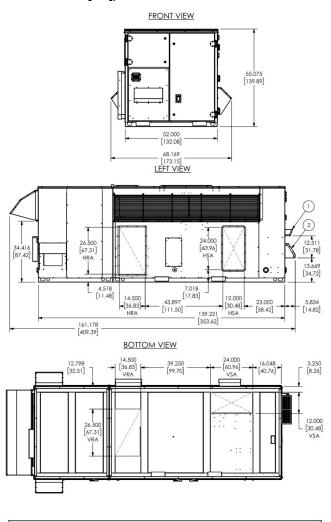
Unit dimensional data for OAB 3 to 9 tons (dual dimensions, in. [cm])
